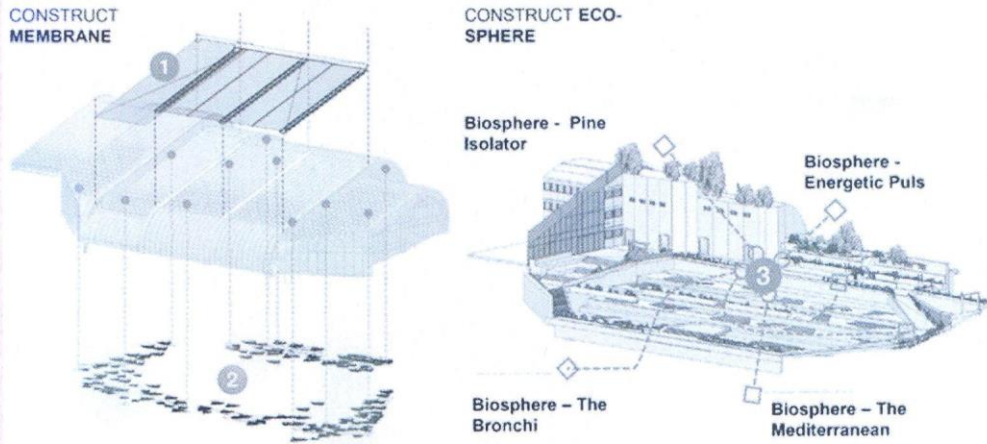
Construct Diagram: Area 1 -Outer Construction Upgrade Roll, Area 2 Collapsible roof-shade system, Area 3 Interior multifunctional construct
